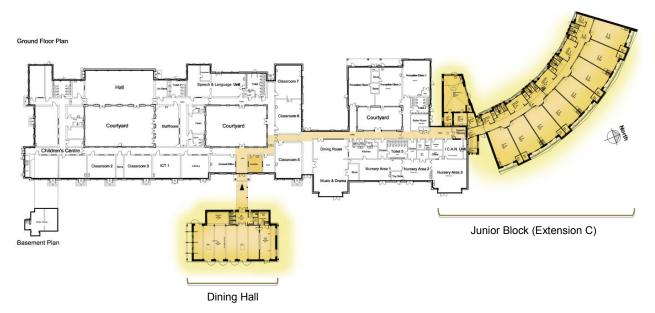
Plan of Castle Hill Primary school, indicating the new Dining Hall and the Junior Block Extension C. Coloured overlay highlights the areas of the building and grounds that were toured during the walkthrough.
